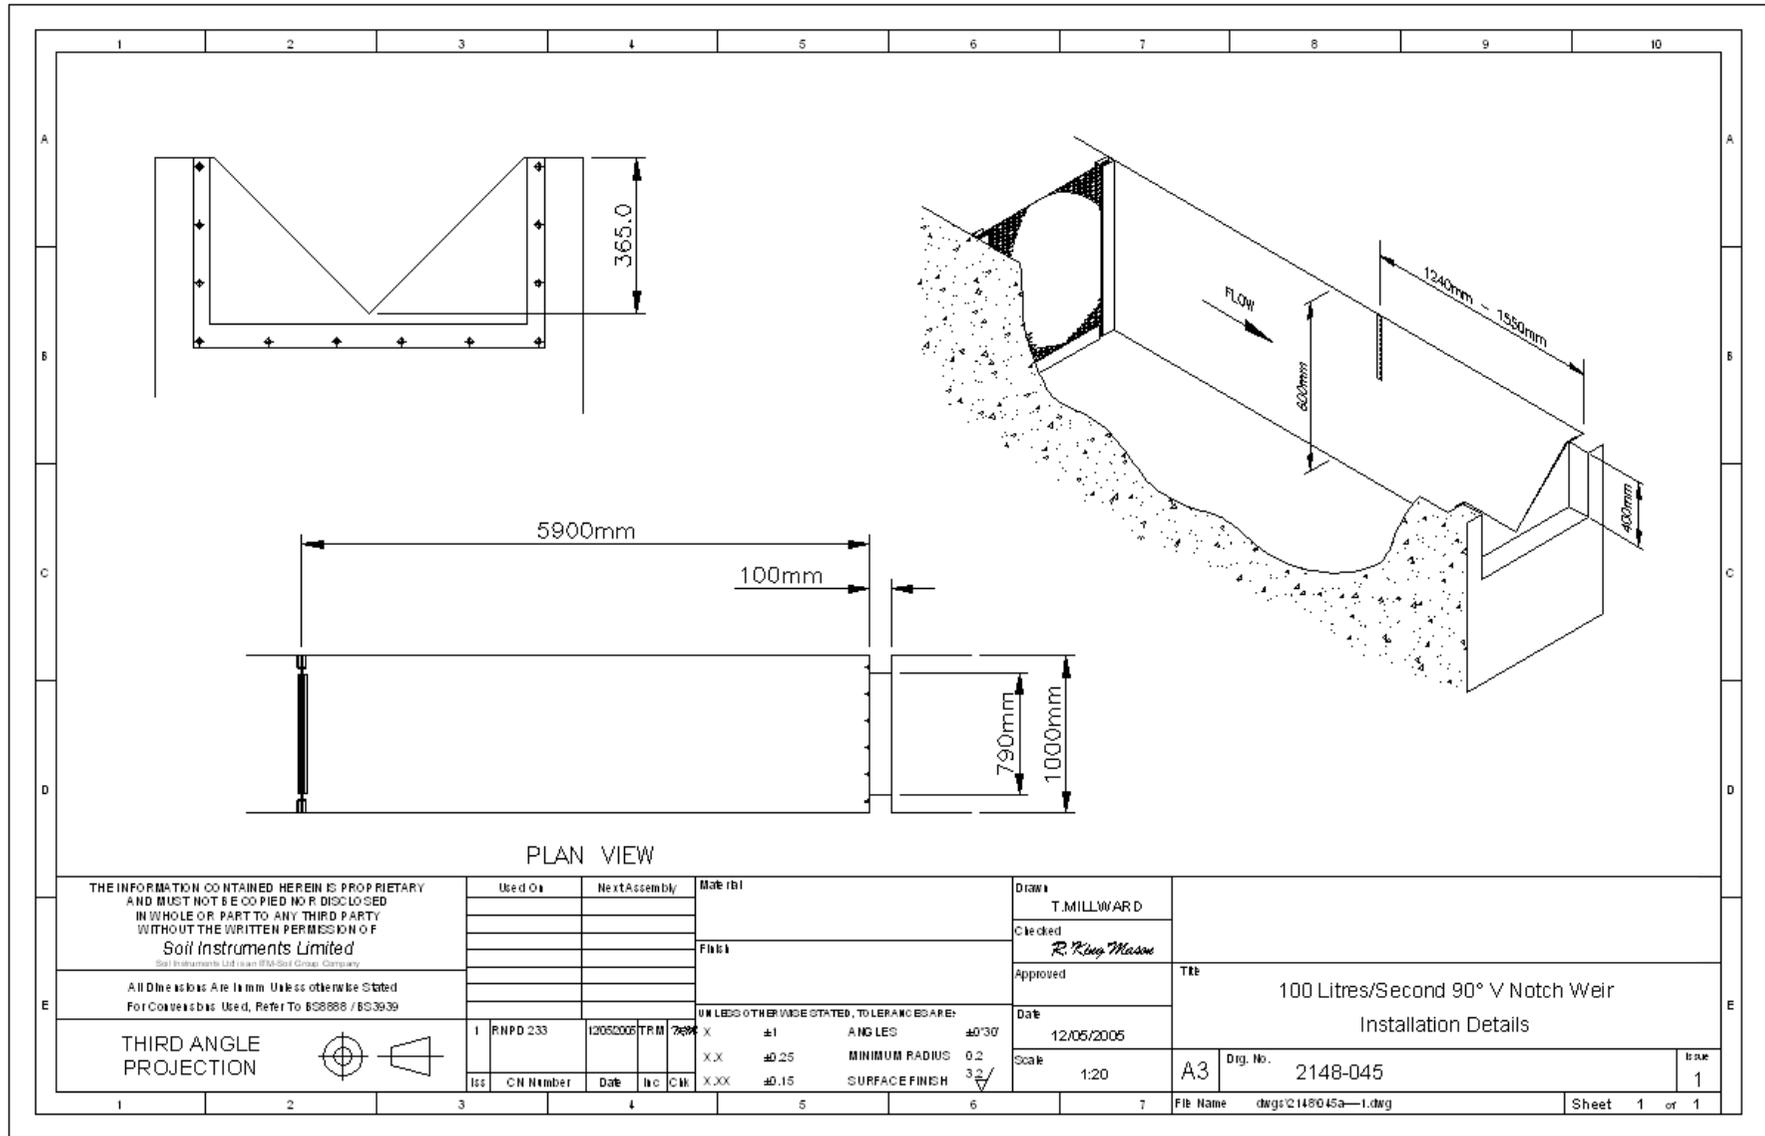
100 Litres/Second 90° V-Notch Weir Installation Details
